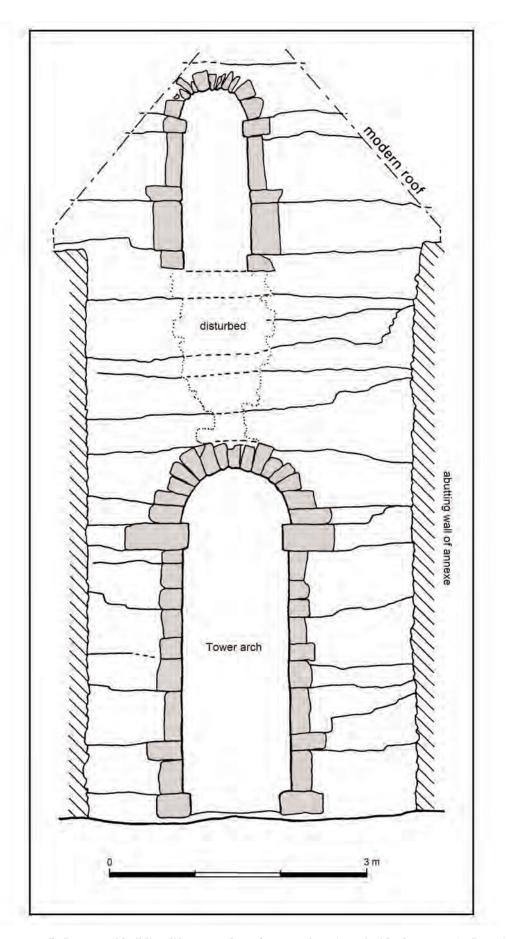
Tower: west wall. Pattern of building-lifts exposed on the outer face (seen inside the annexe). Drawing: Warwick Rodwell
